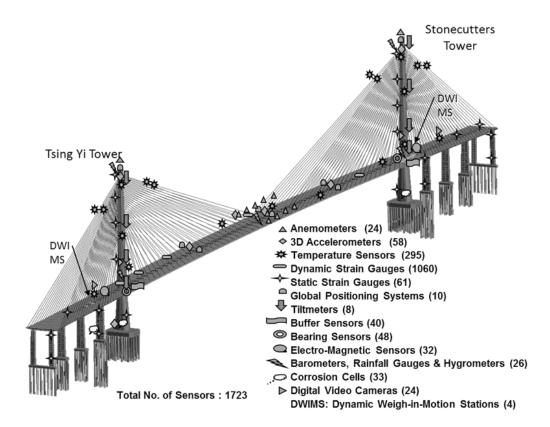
Layout of sensory systems on Stonecutters Bridge.
